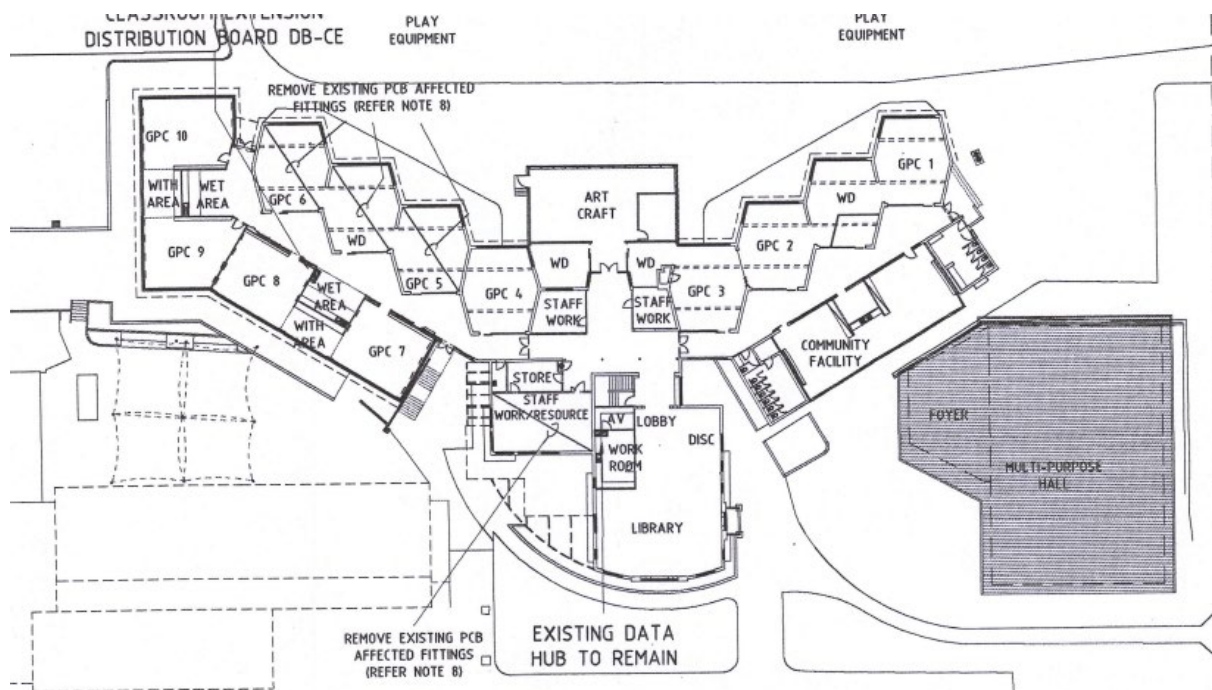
Floor plan showing the eight original hexagonal classrooms and circulation corridor behind. GPC7-10, library, staff work/resource room, community facilities and art/craft space are all later additions. (Source: BP 2580)
